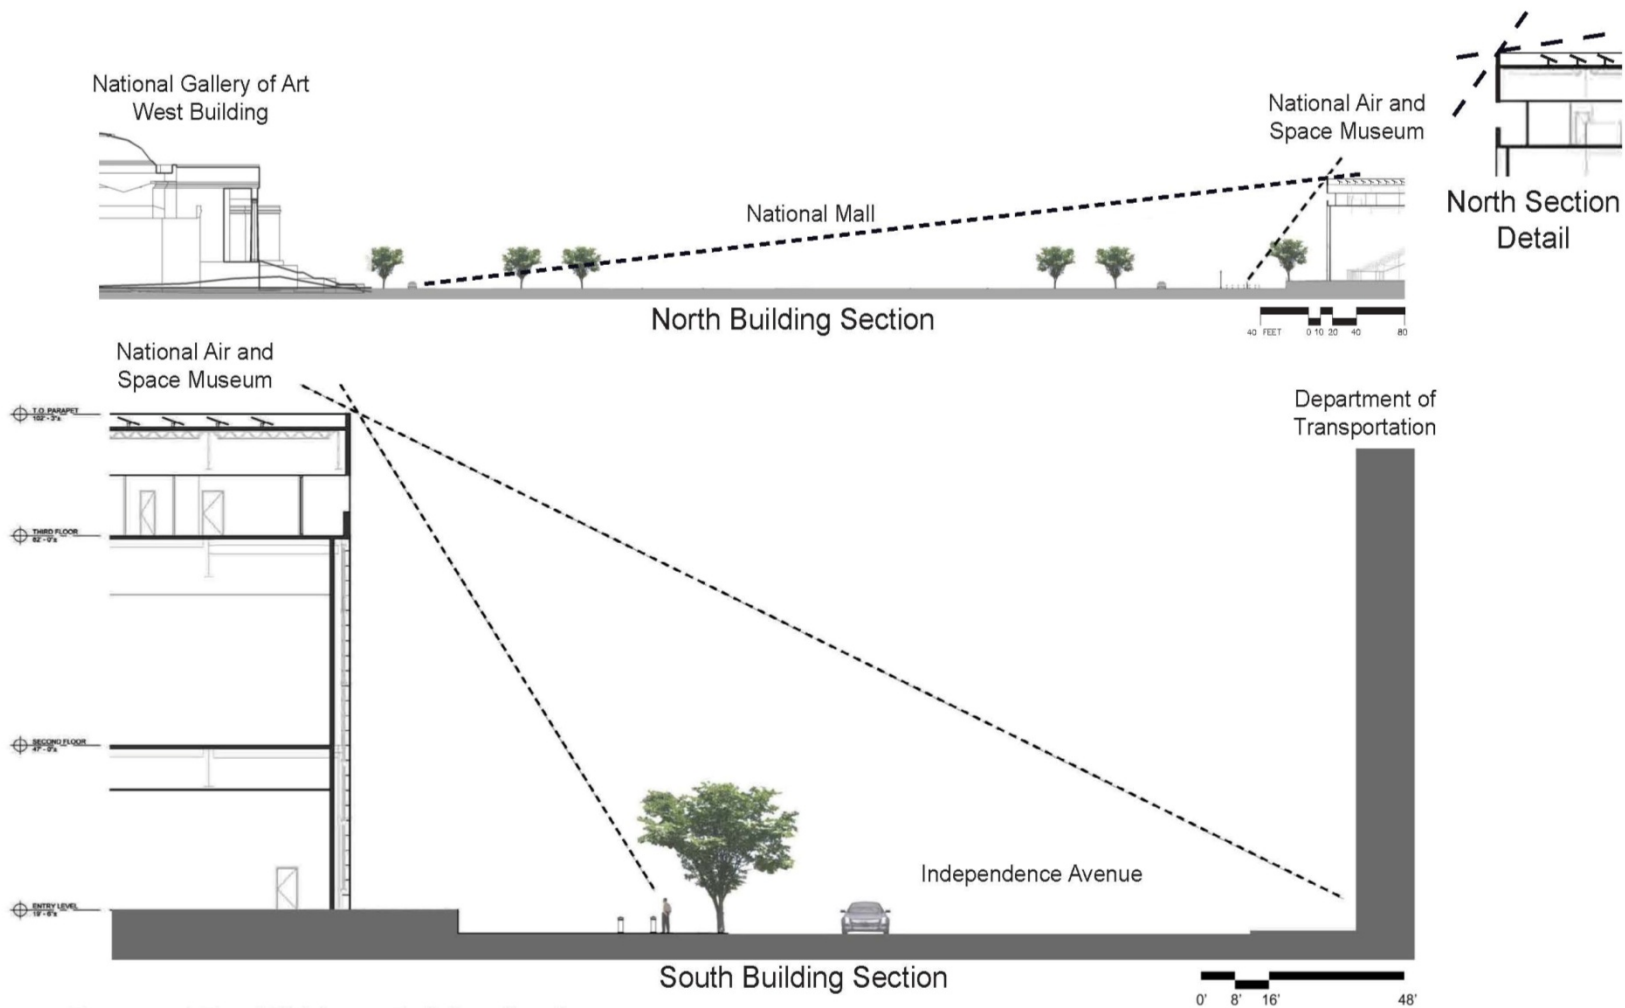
24: Pedestrian views of proposed roof photovoltaic array. (Source: QEA.)
